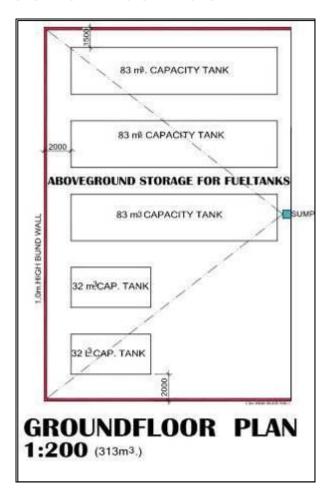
Proposed bund structure (9m x 25m), not constructed.
